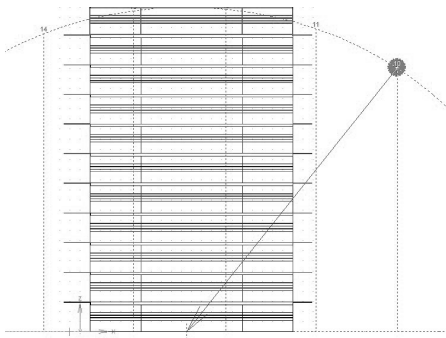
Model 4, Cantilevered floor plate and louvers on East and West Orientations.
